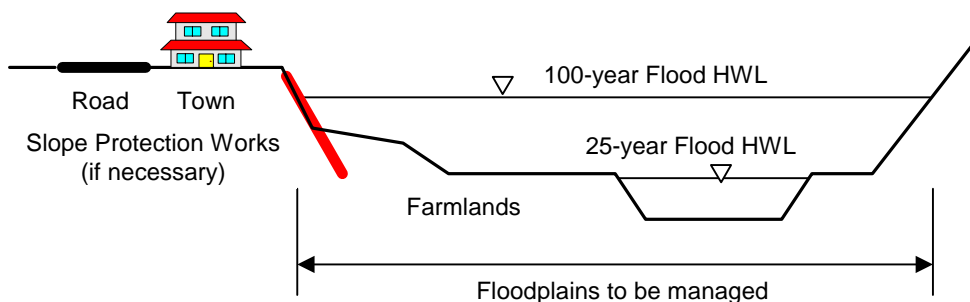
Hydrological Design Scale Adopted in the Master Plan
